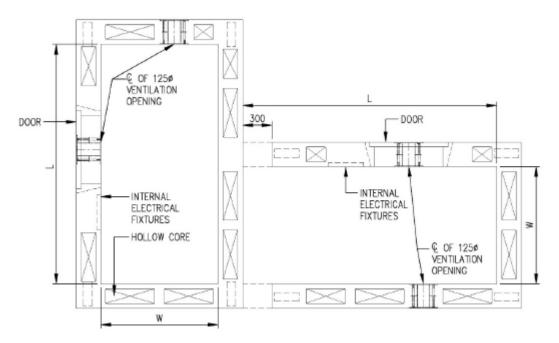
H - Precast HS And C-Shaped Precast HS With Connection Between Longer And Shorter Walls Respectively And With HS Doors On Long Wall
